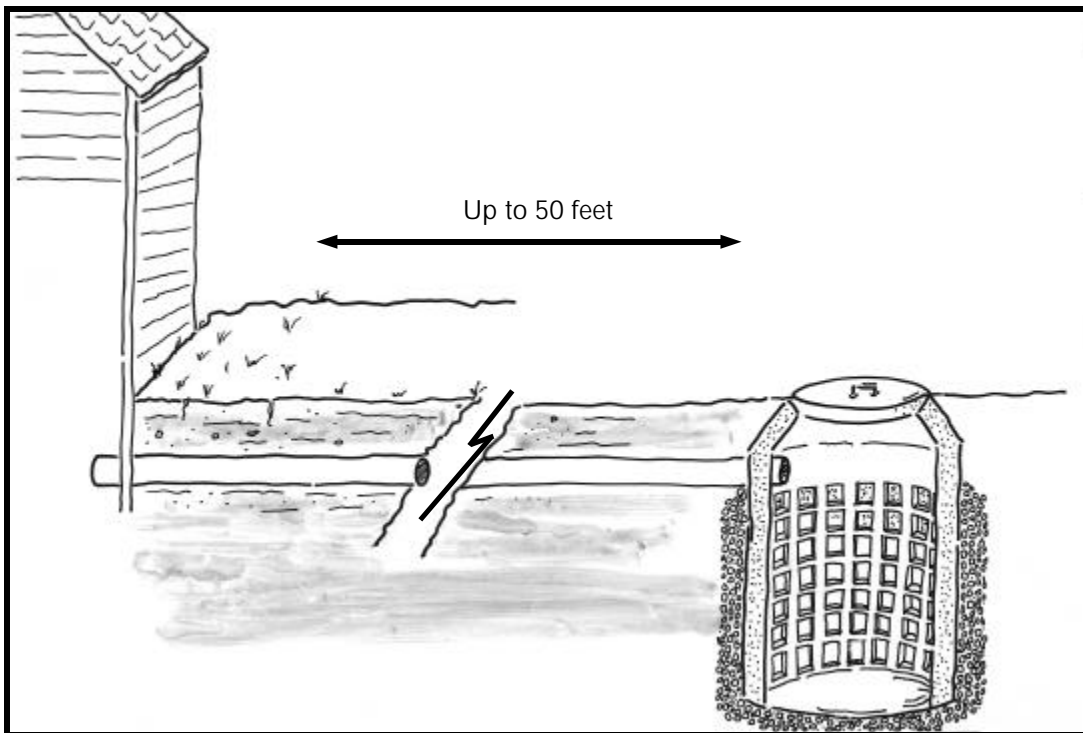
Cut away of a typical cesspool with a concrete vault. Wastewater flows by gravity from the building sewer to the cesspool, which may be located up to 50 feet from the foundation.
